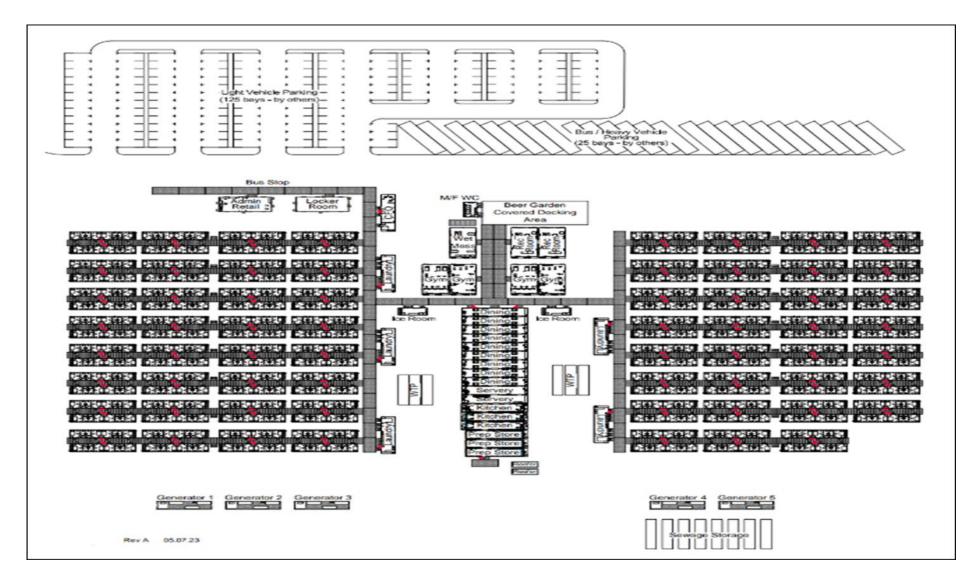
Example 2 – layout of a 500-person accommodation facility
